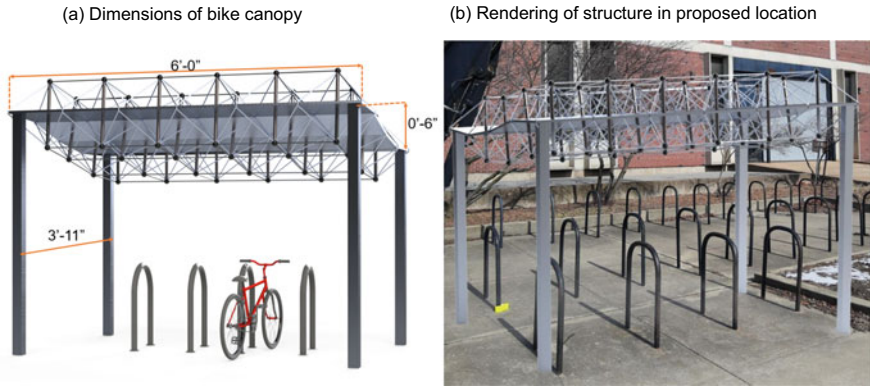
Preliminary rendering of aluminum plate tensegrity structure (NTS) (a) over rendered bike rack with dimensions (b) next to Newmark Civil Engineering Building
